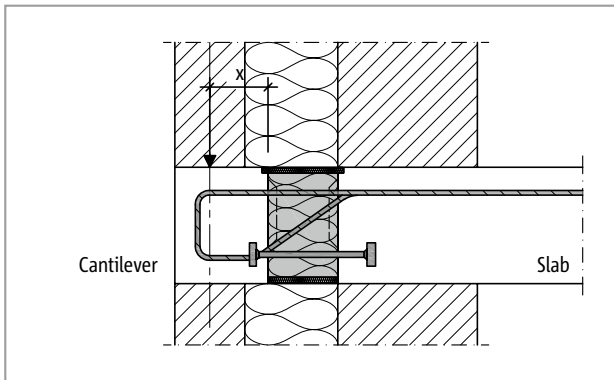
Schöck Isokorb® XT type O: Corbel with faced masonry
